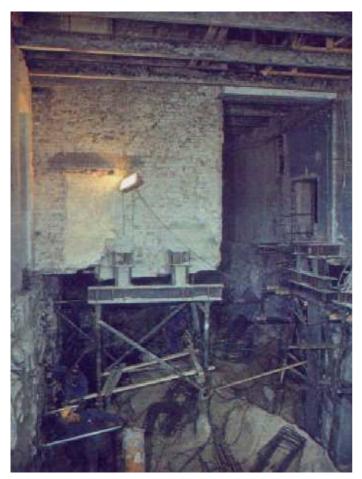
Middle wall. Drilled steel piles. Steel beams and jacking system. Bracing.
